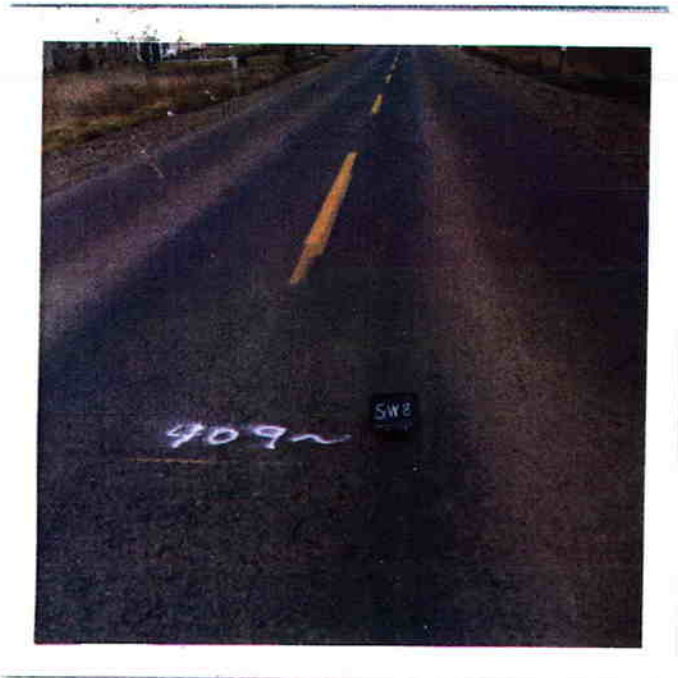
Typical Roadway Cross-Sections Before Construction
